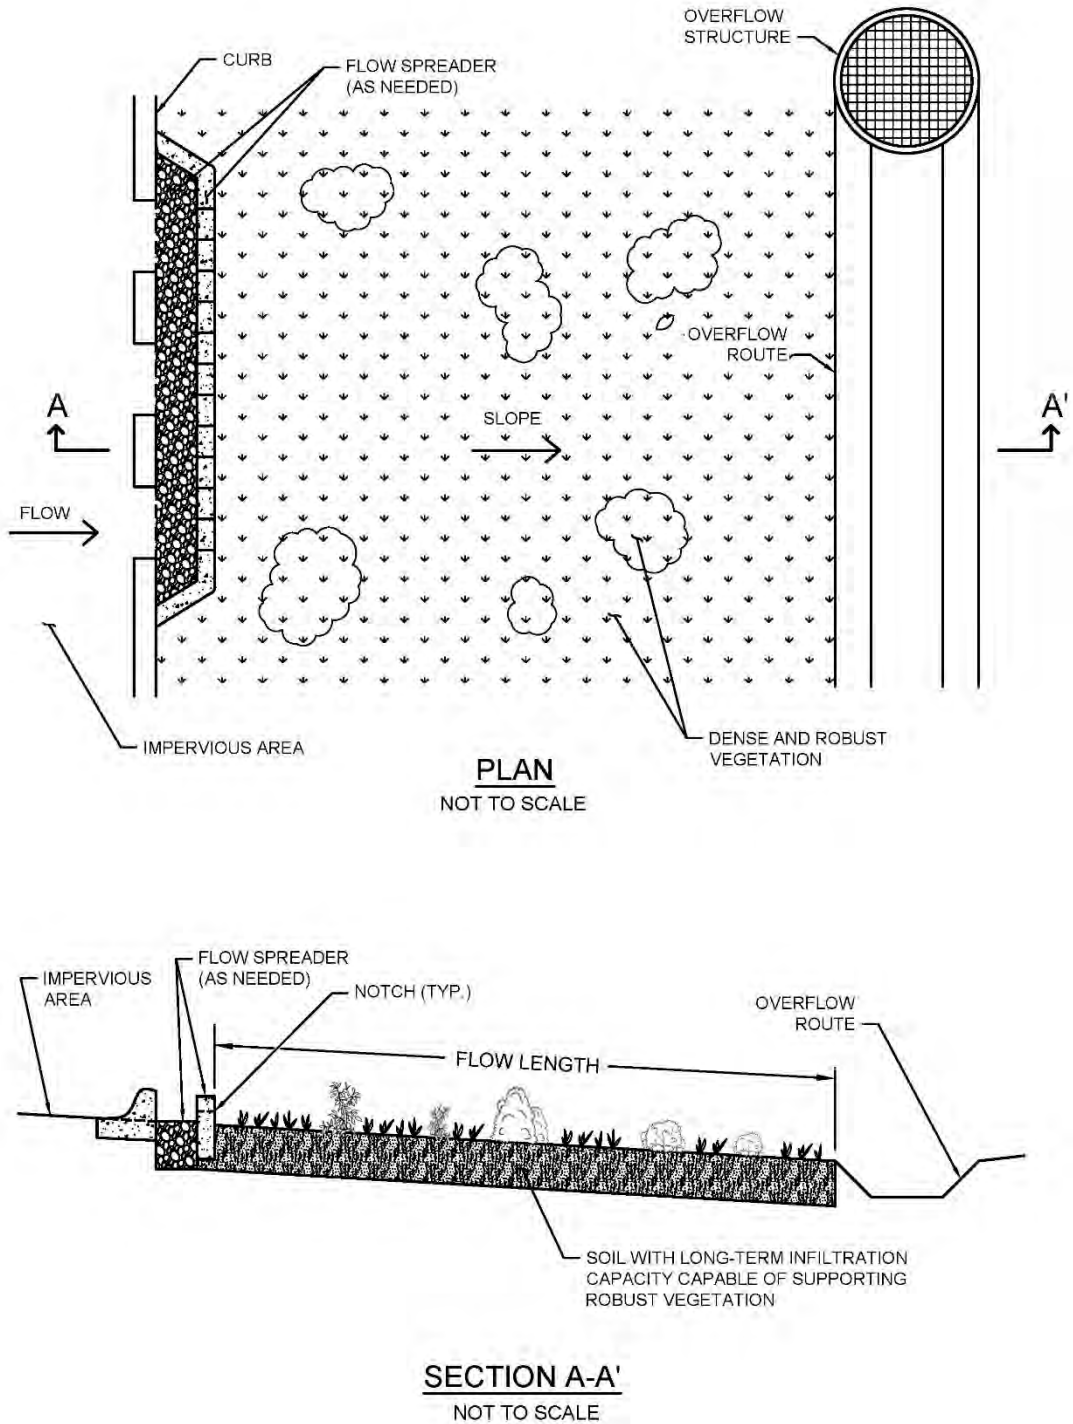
Typical Plan and Section view of an Impervious Area Dispersion BMP
